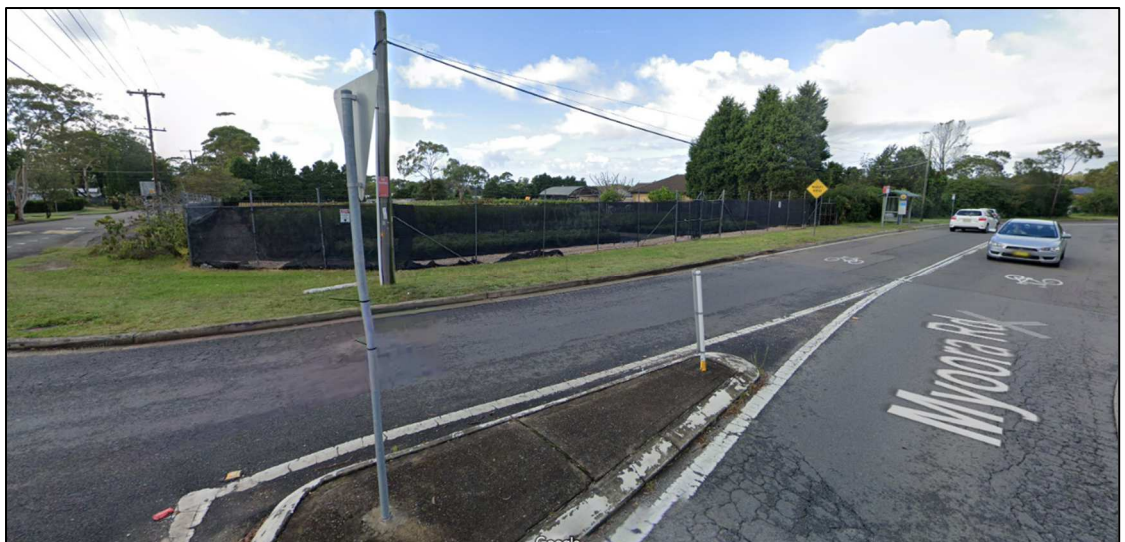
Subject site viewed from Myoora Road looking east (source: Google Maps)
